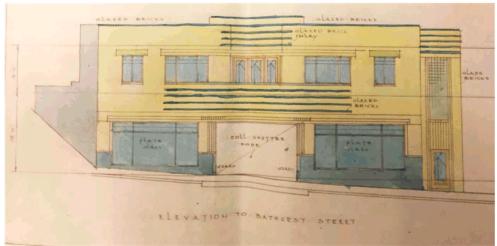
1937 plan showing Bathurst Street elevation of the garage (TAHO, AE417/1/2108, 125 Bathurst Street (6871).
